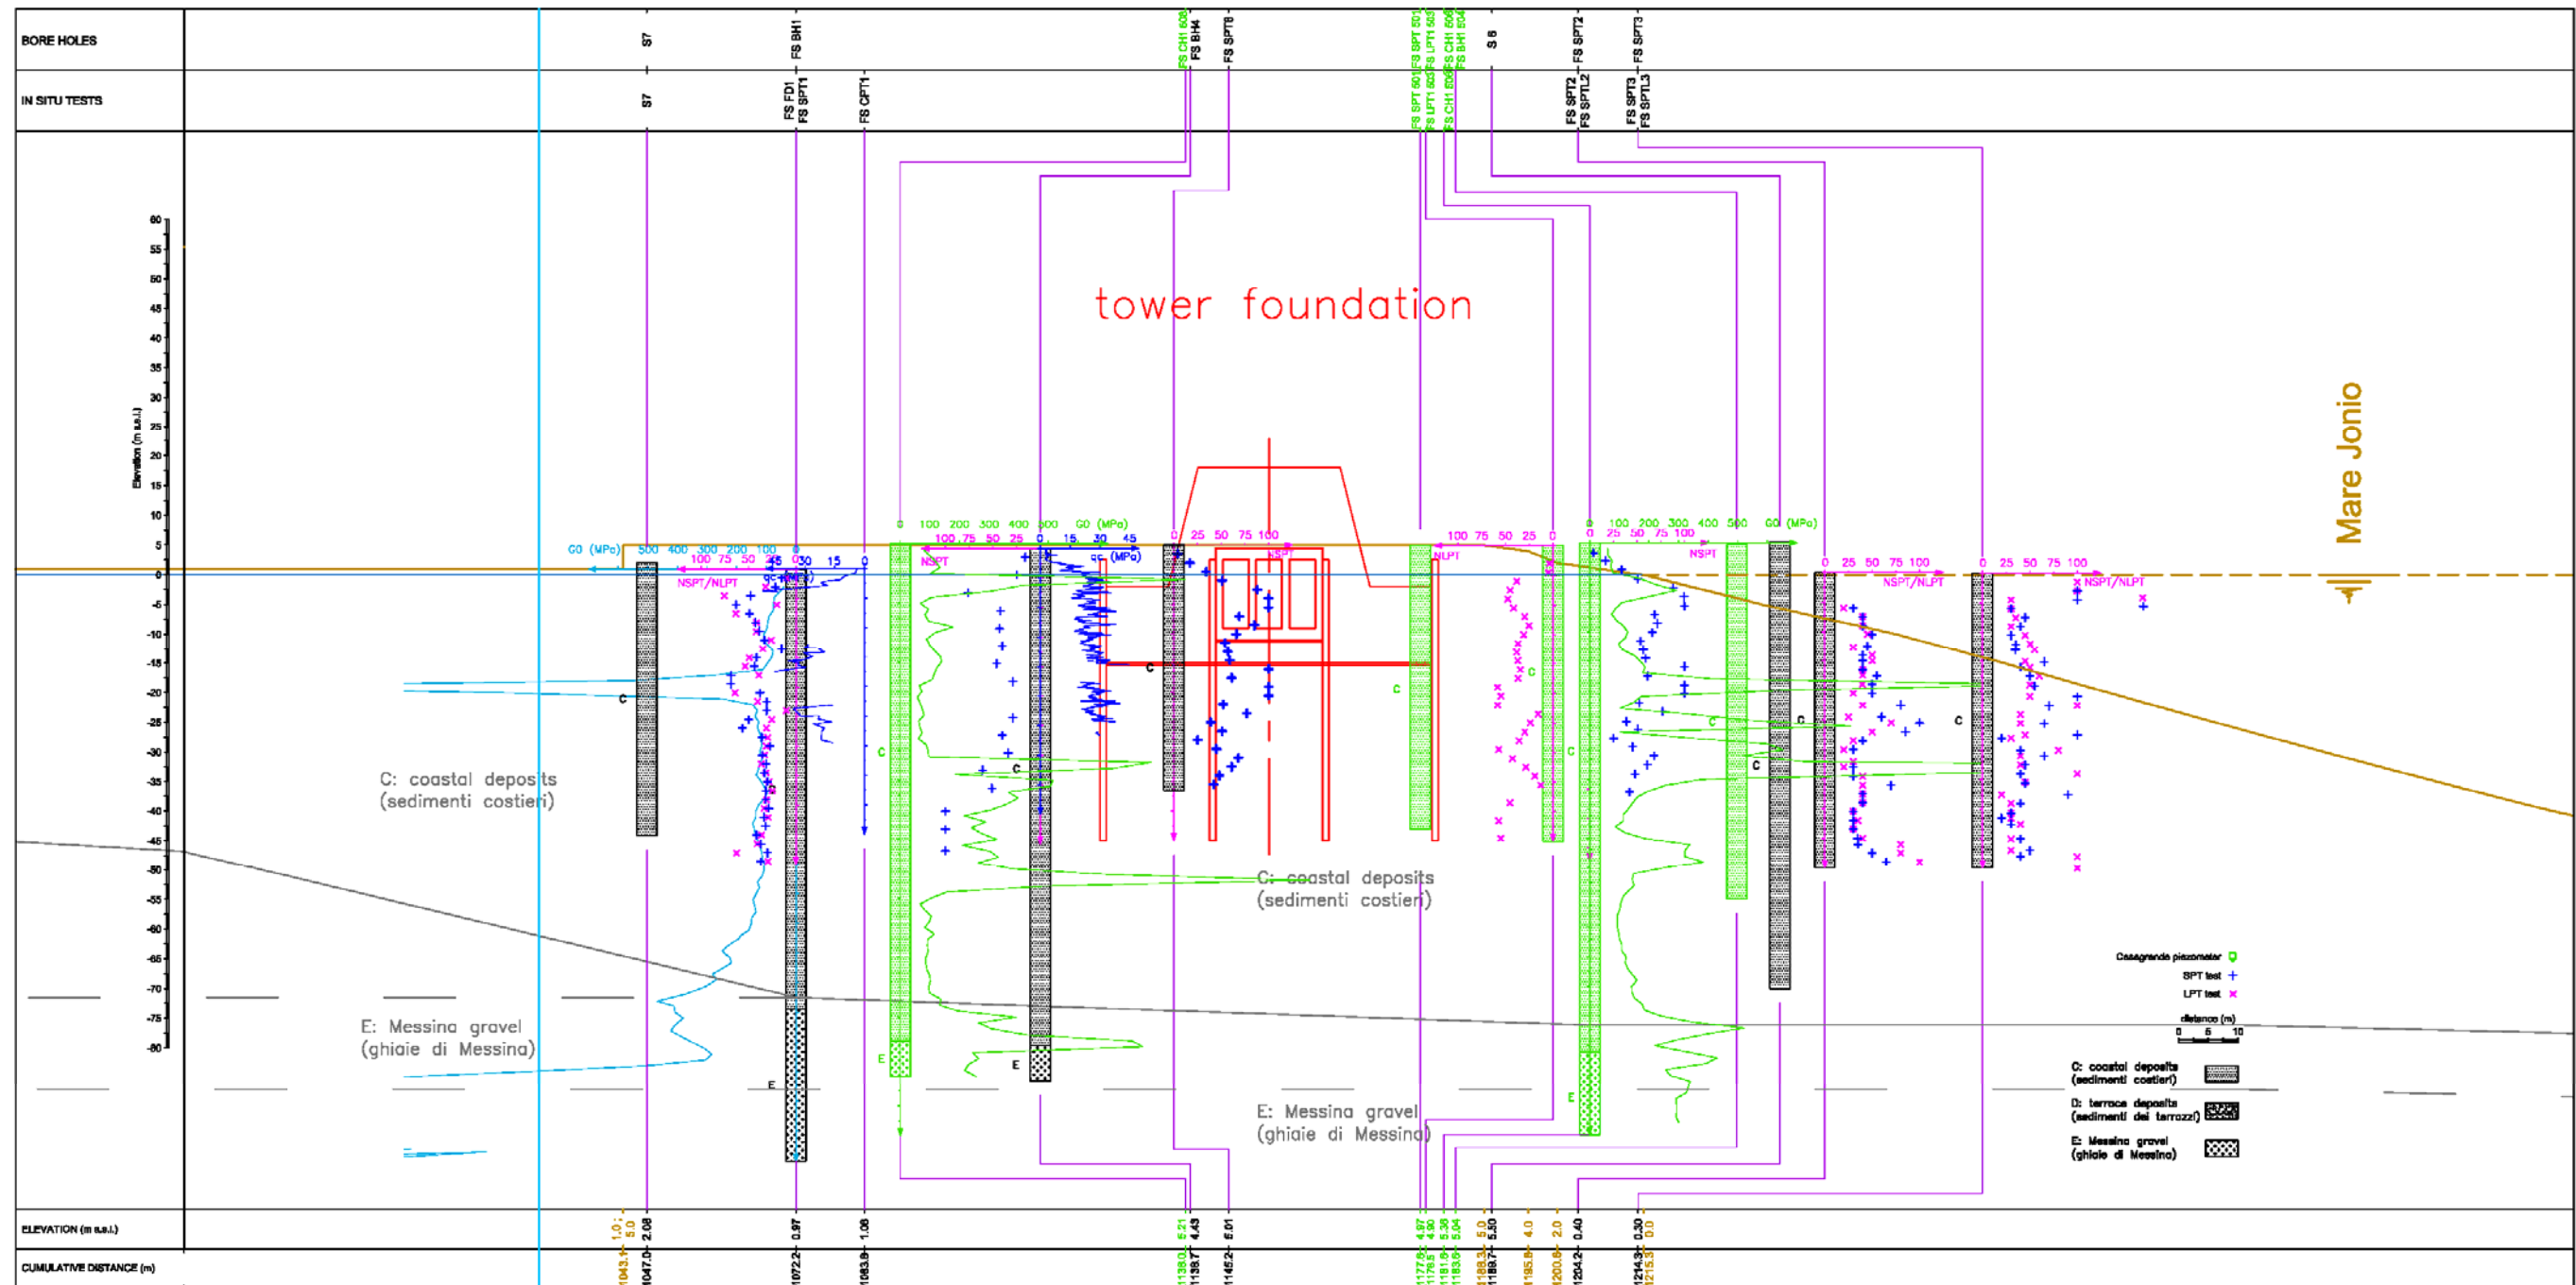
Sicilia shore - longitudinal section at the tower foundation
